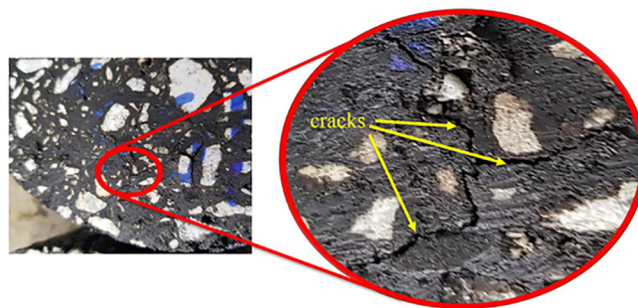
Cracking on rubberized asphalt sample after LTA.
